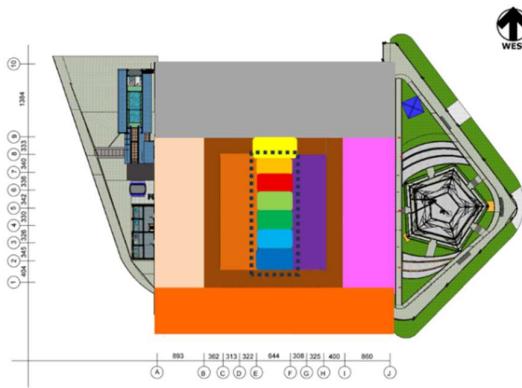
Annotated floor plan of the building with legend. Tsgoe and Ttda in the floor plan of the first level of TGMOTSOB
